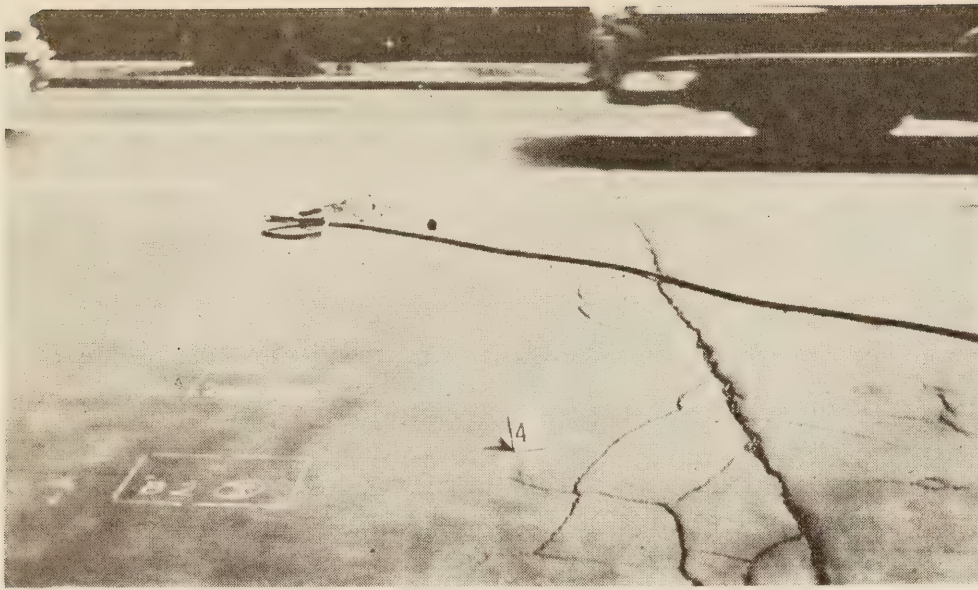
View of section B-2 in April 1955, showing cracks at joint and over areas of base failure.
